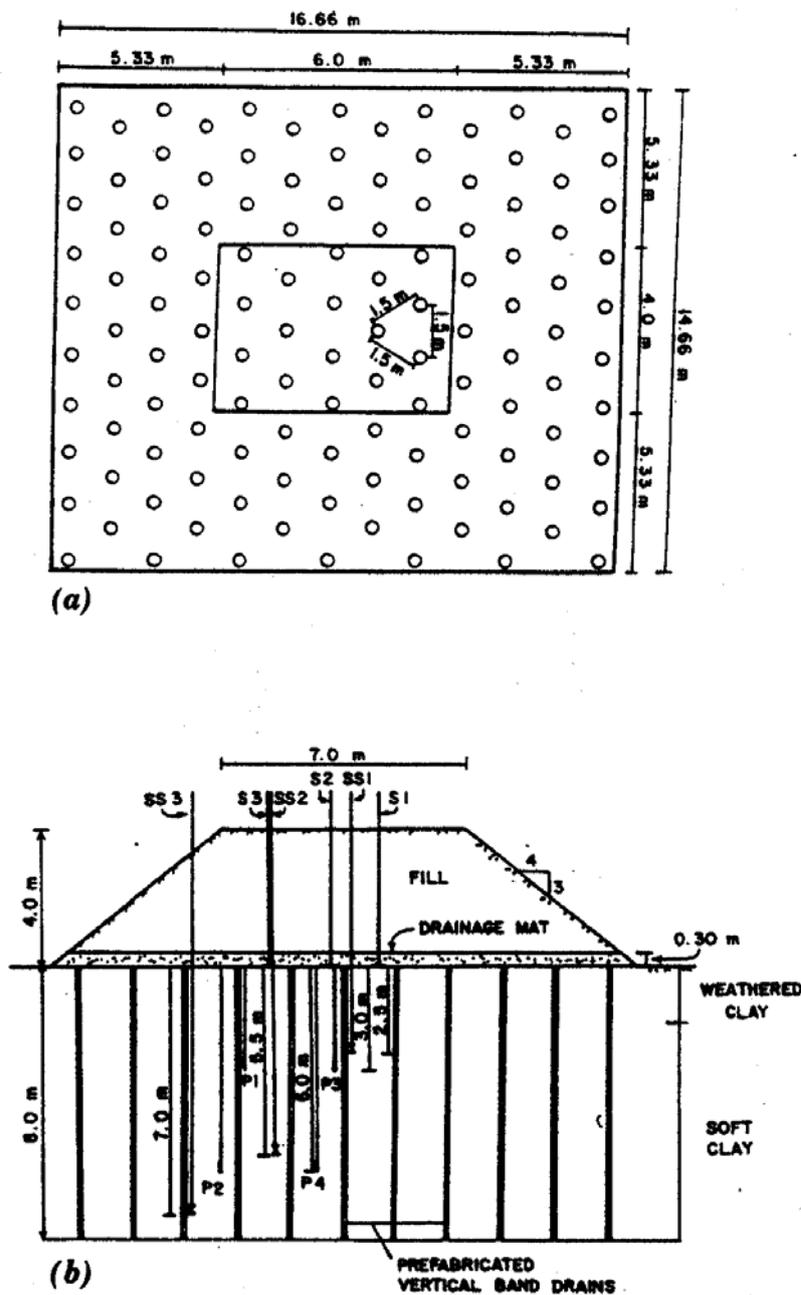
Embankment plan, section view and layout of field instrumentation at PVD site (Bergado et al. 1992)
